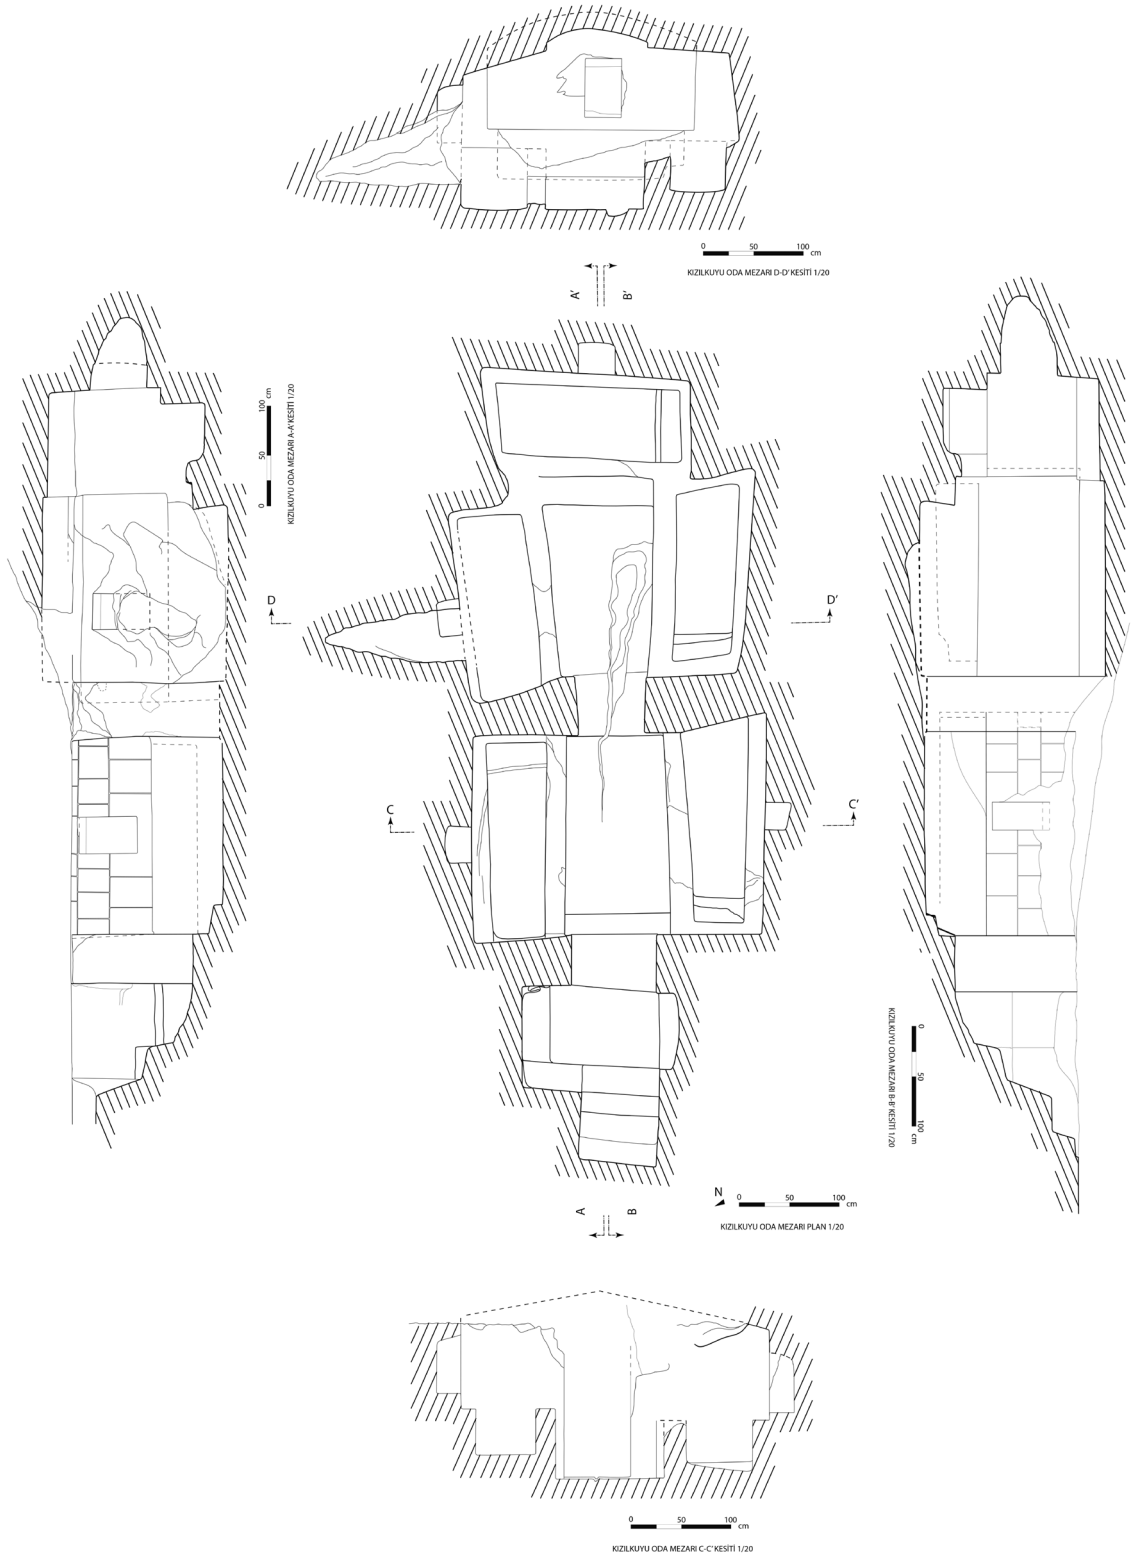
Plan and cross section of the tomb (drawing by Gürol Aytepe).
